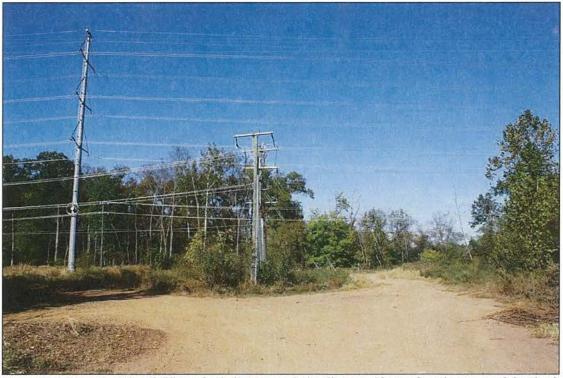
Photo location 6- View of existing transmission line corridor and setting on south bank of Broad Run, facing west.
